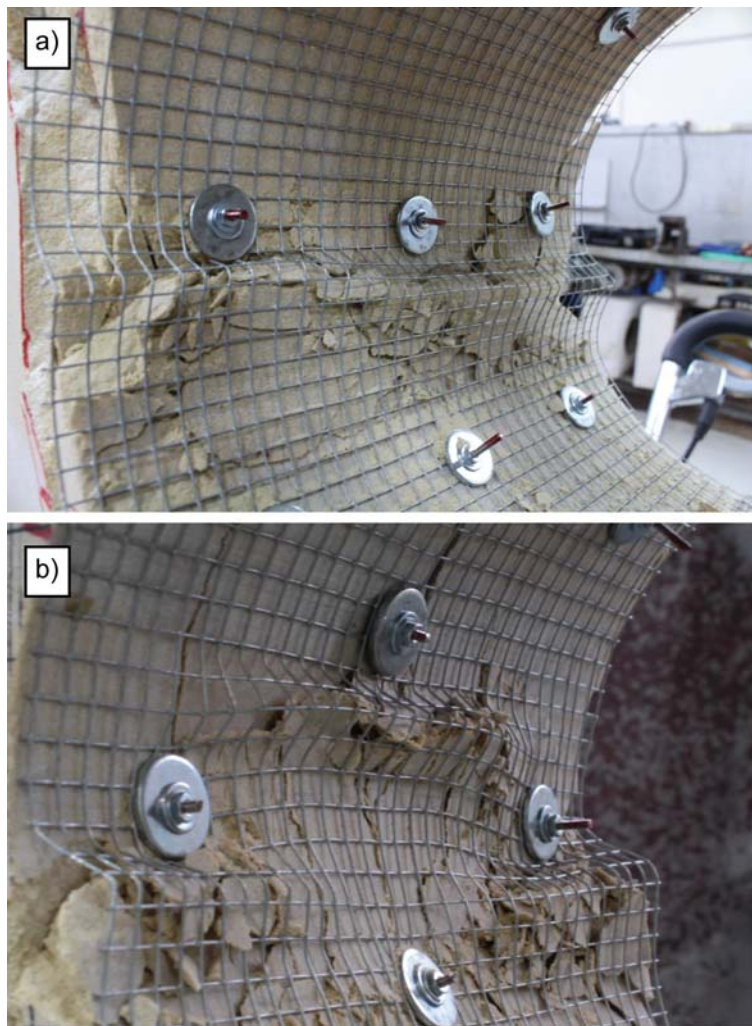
Failures on tunnel sidewall a) square bolting pattern b) staggered bolting pattern.
